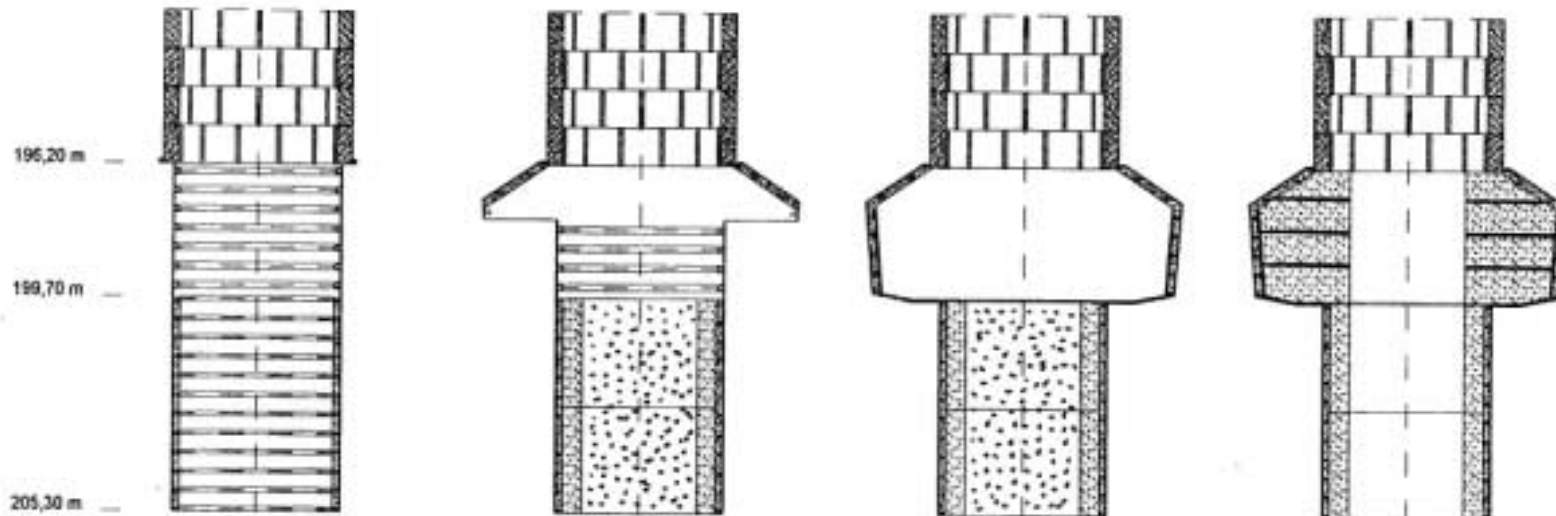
Second shaft: scheme of the excavation of the foundation.
